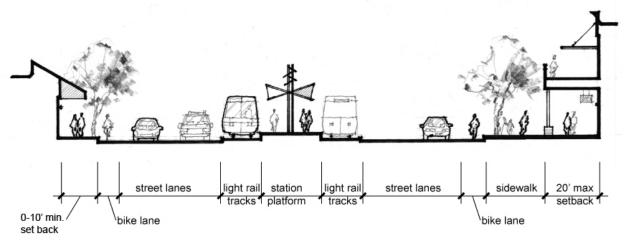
B Transportation Overlay District Cross Section of Typical Street
